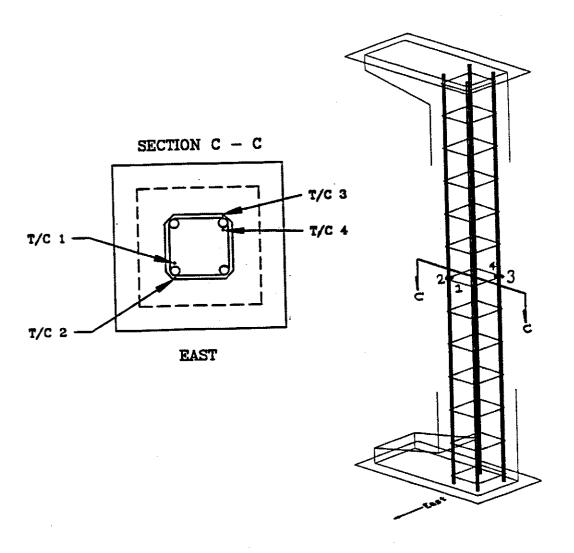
Locations of Thermocouples on Steel Bars Column 2 (TFRI)
